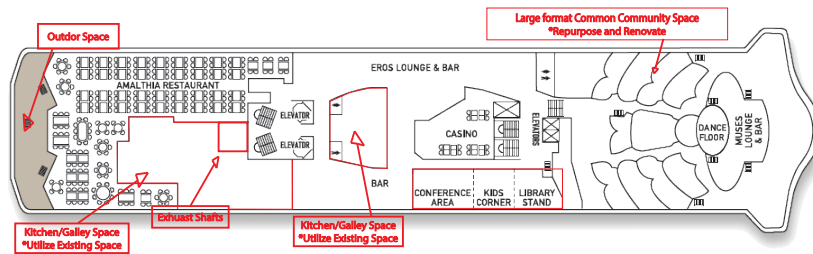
Guest Entertainment Spaces for Renovation (Shown on Deck 8)
